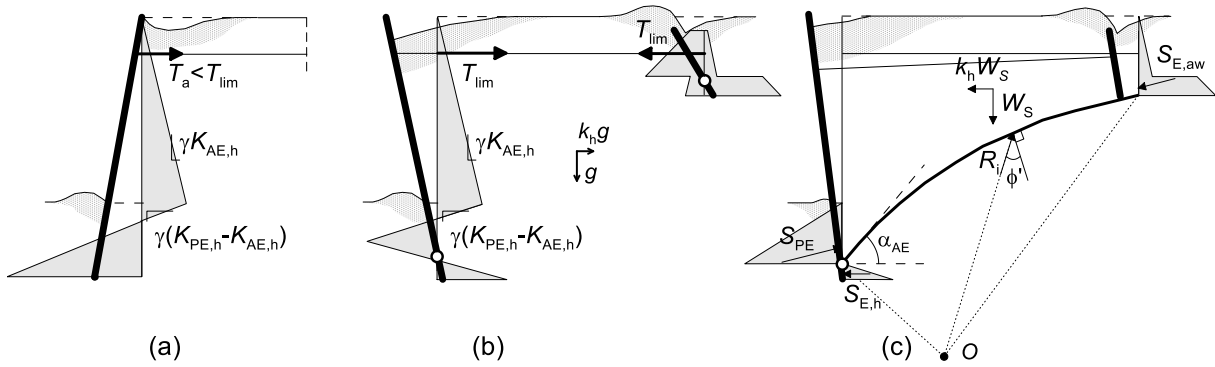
Potential plastic mechanisms for ASSP walls. Schematic deformed shape and LE earth pressure distributions at the onset of the yielding condition: (a) toe failure; (b) anchor failure and (c) global failure.
